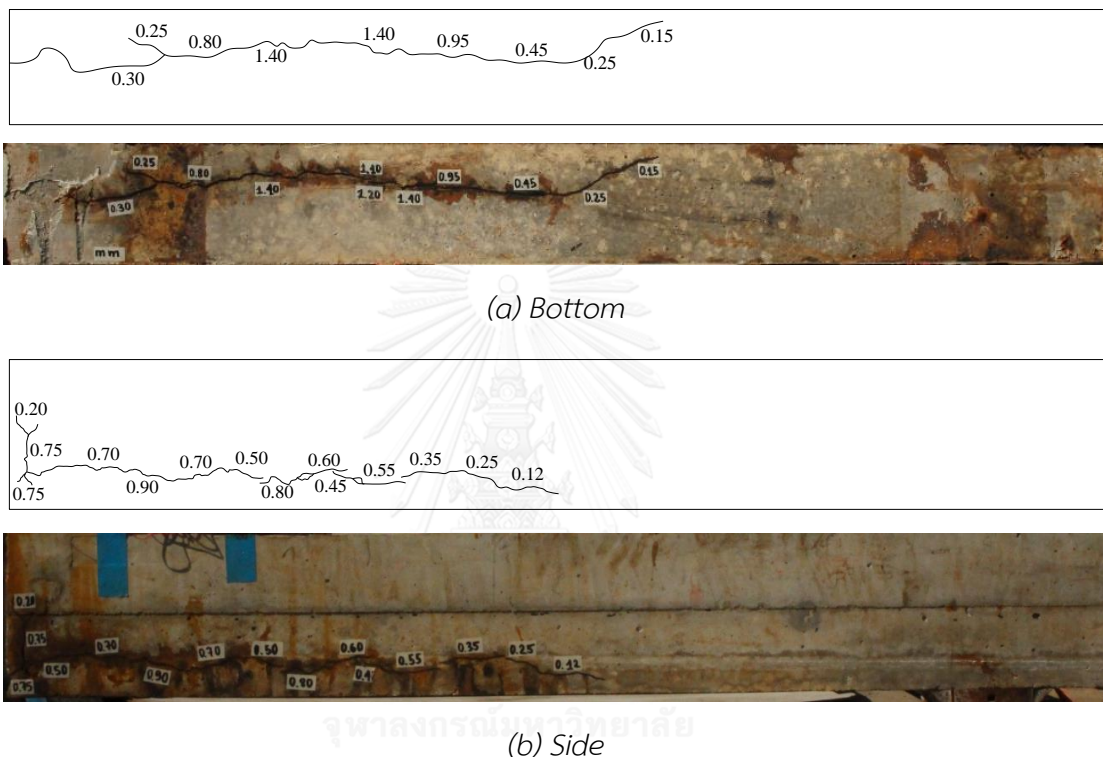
Crack pattern and crack width of SB-AFM beam (unit: mm)
